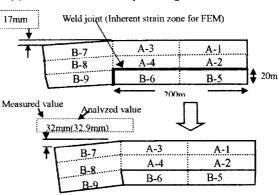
(b) :Deformation of VLFS caused by welding of floating units
